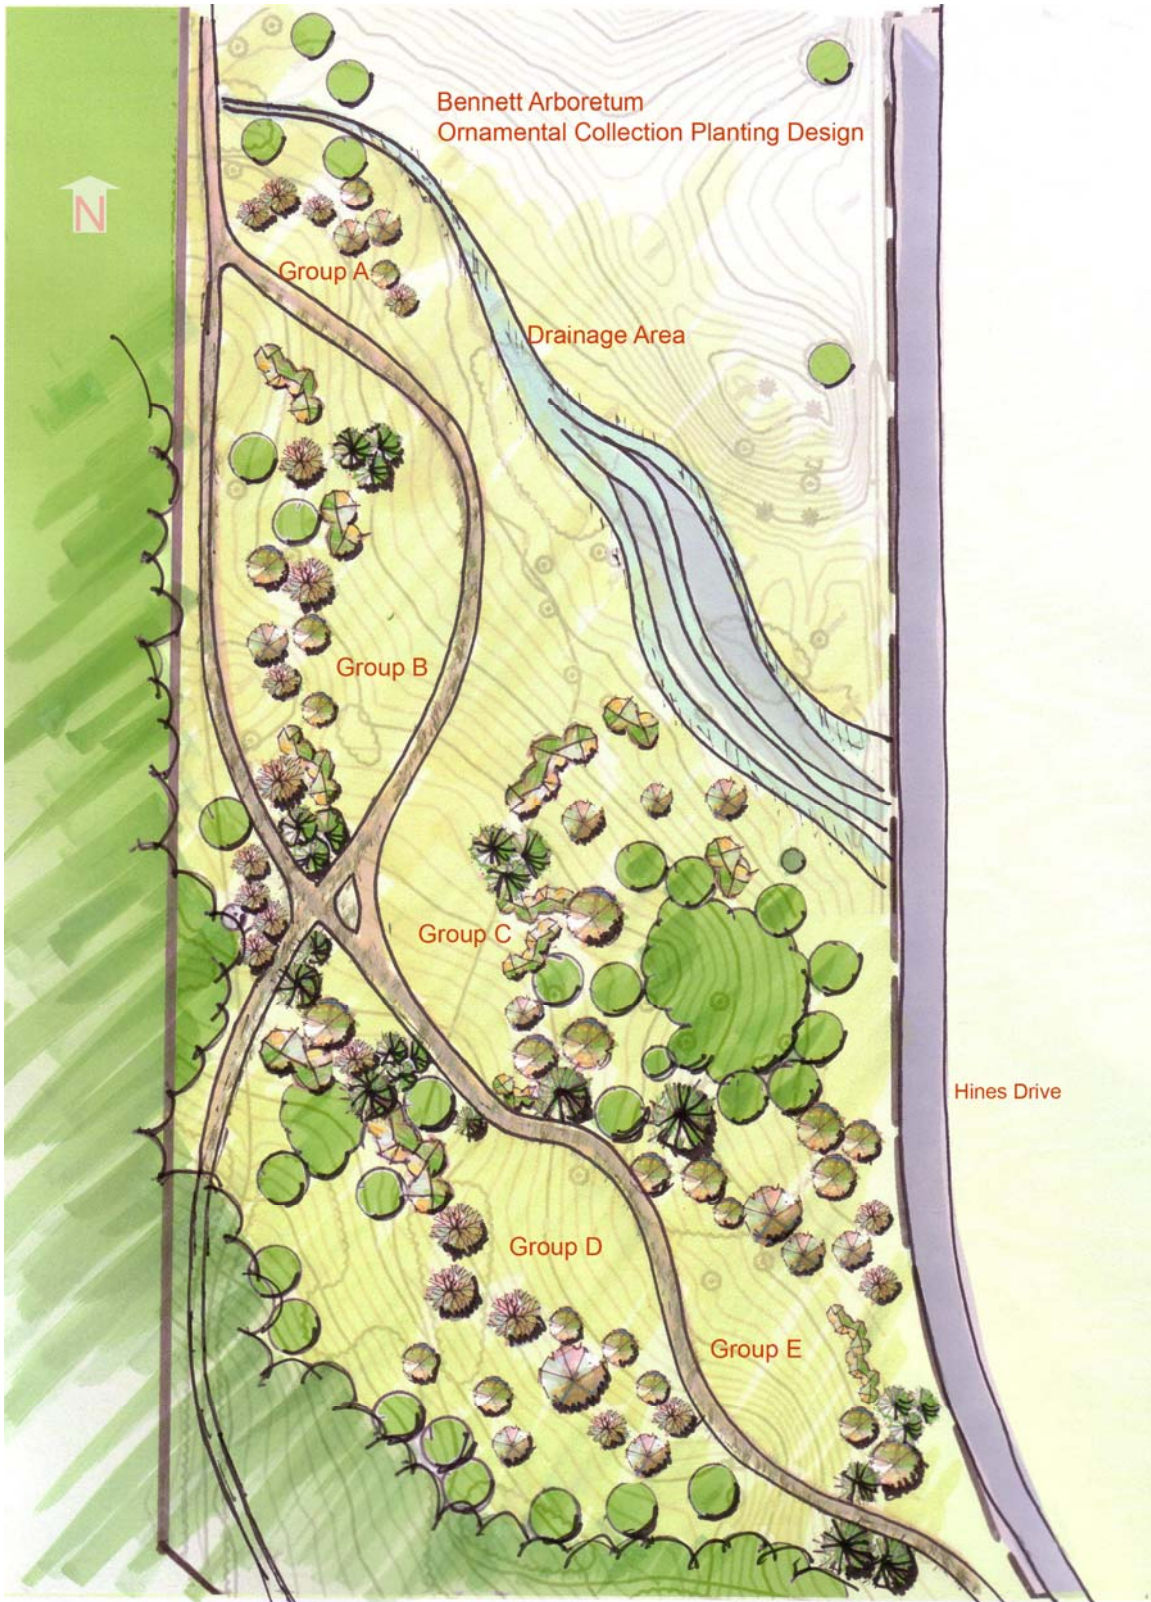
Proposed structure for planting plan in Ornamental Collection. Existing vegetation is solid green
